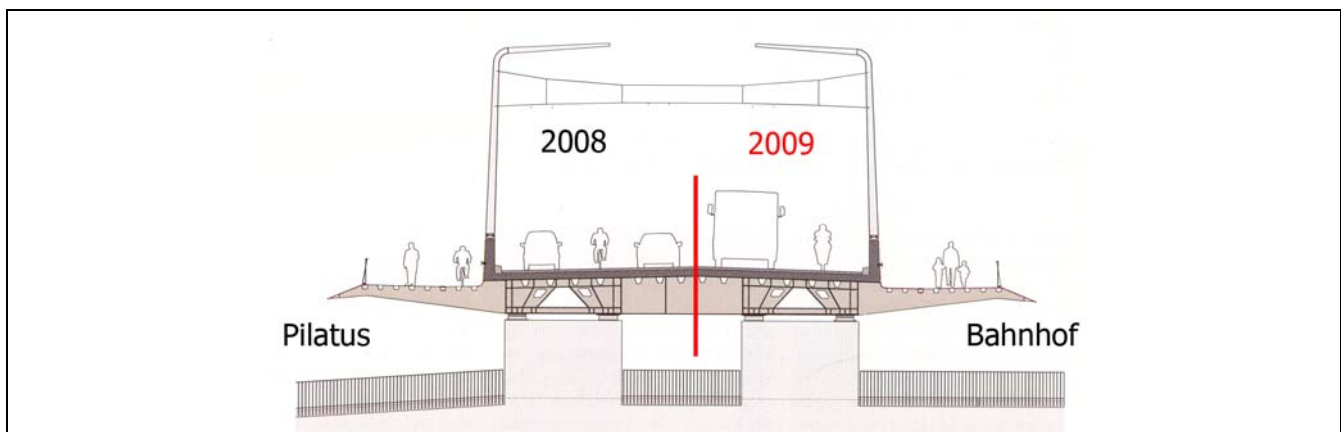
Langensand Bridge Lucerne. The paper covers tests performed on the Pilatus side half of the bridge.
